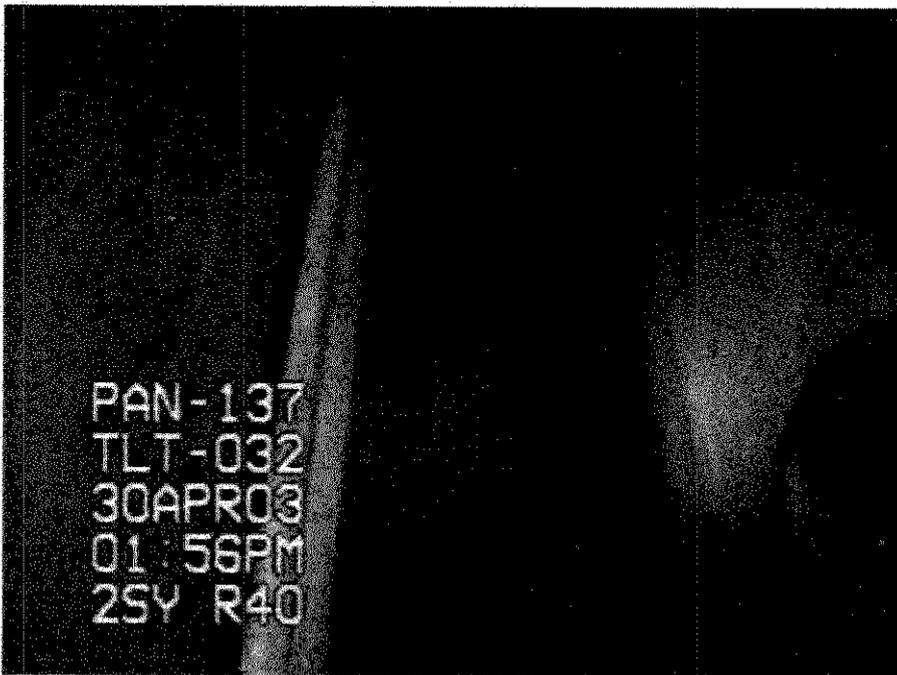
SY-102 Riser 40, Secondary Tank Wall (Left, 2003)
